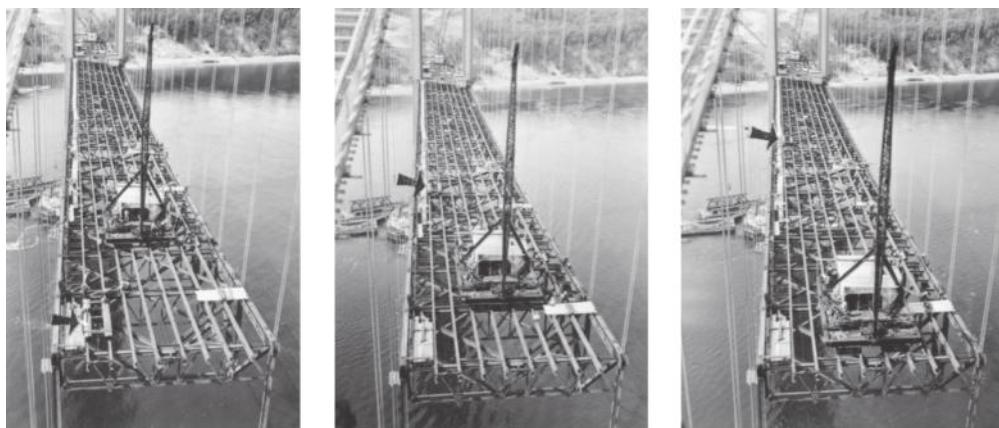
Moving deck traveler forward, second Tacoma Narrows Bridge, Washington, 1950. Traveler pulling falls leadline passes around sheave beams at forward end of stringers, and is attached to front of material car (at left). Material car is pulled back toward tower, advancing traveler two panels to its new position at end of deck steelwork. Arrows show successive positions of material car. (a) Traveler at start of move, (b) traveler advanced one panel, and (c) traveler at end of move.
